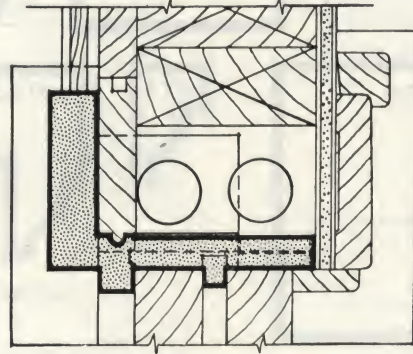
Inside liner removed and wall board extended over the edge of pulley stile.
